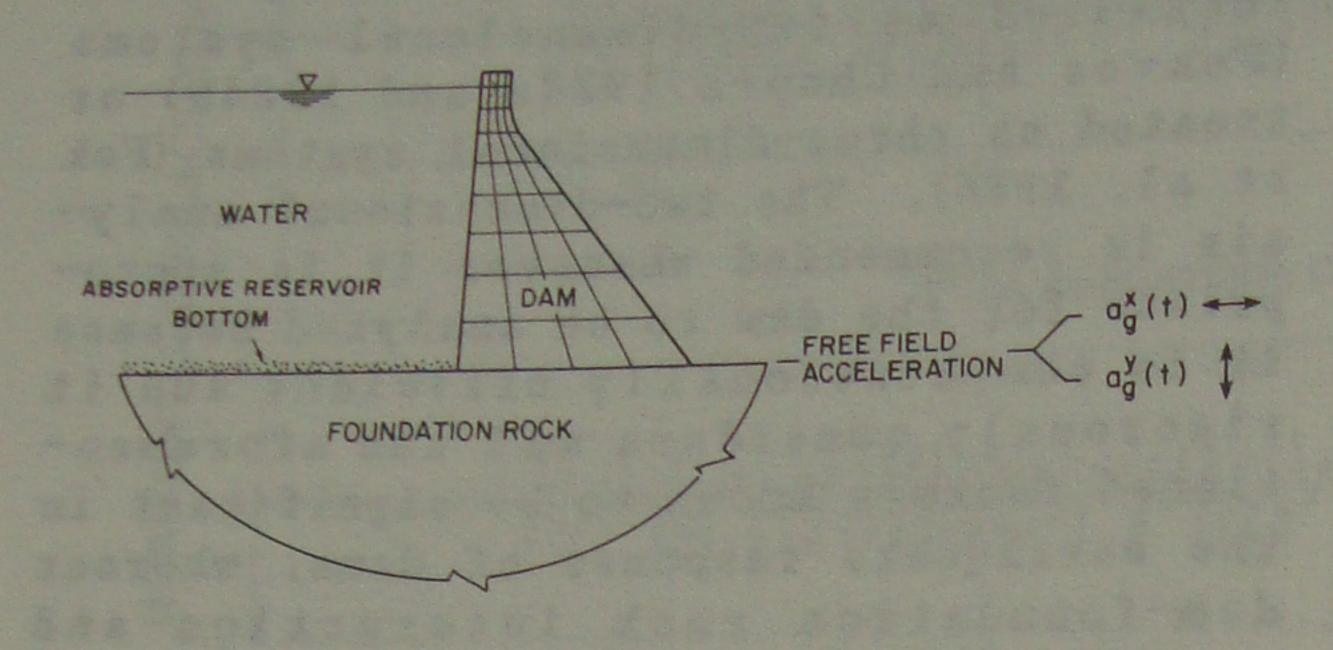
Dam-water-foundation rock system (Fenves and Chopra 1984a)
